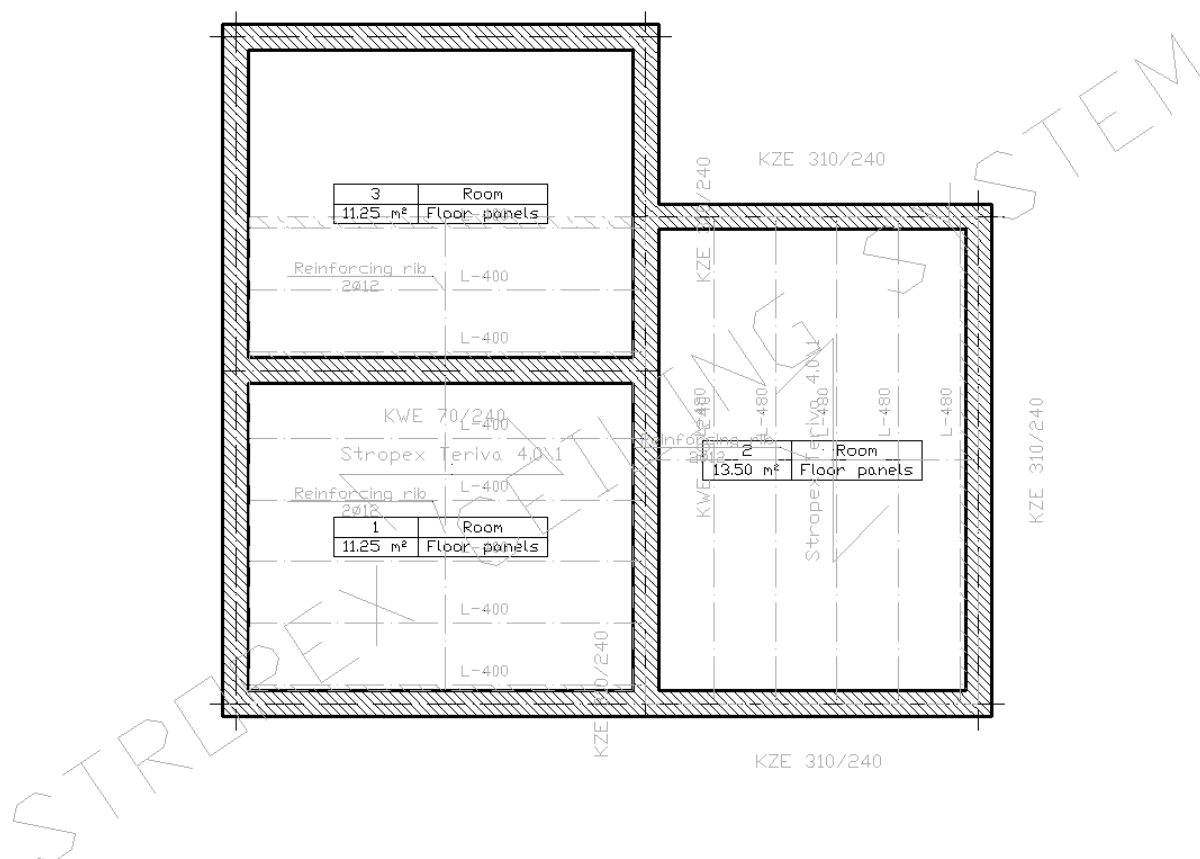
Ceiling arrangement made with Insert framed ceiling with rectangle function
